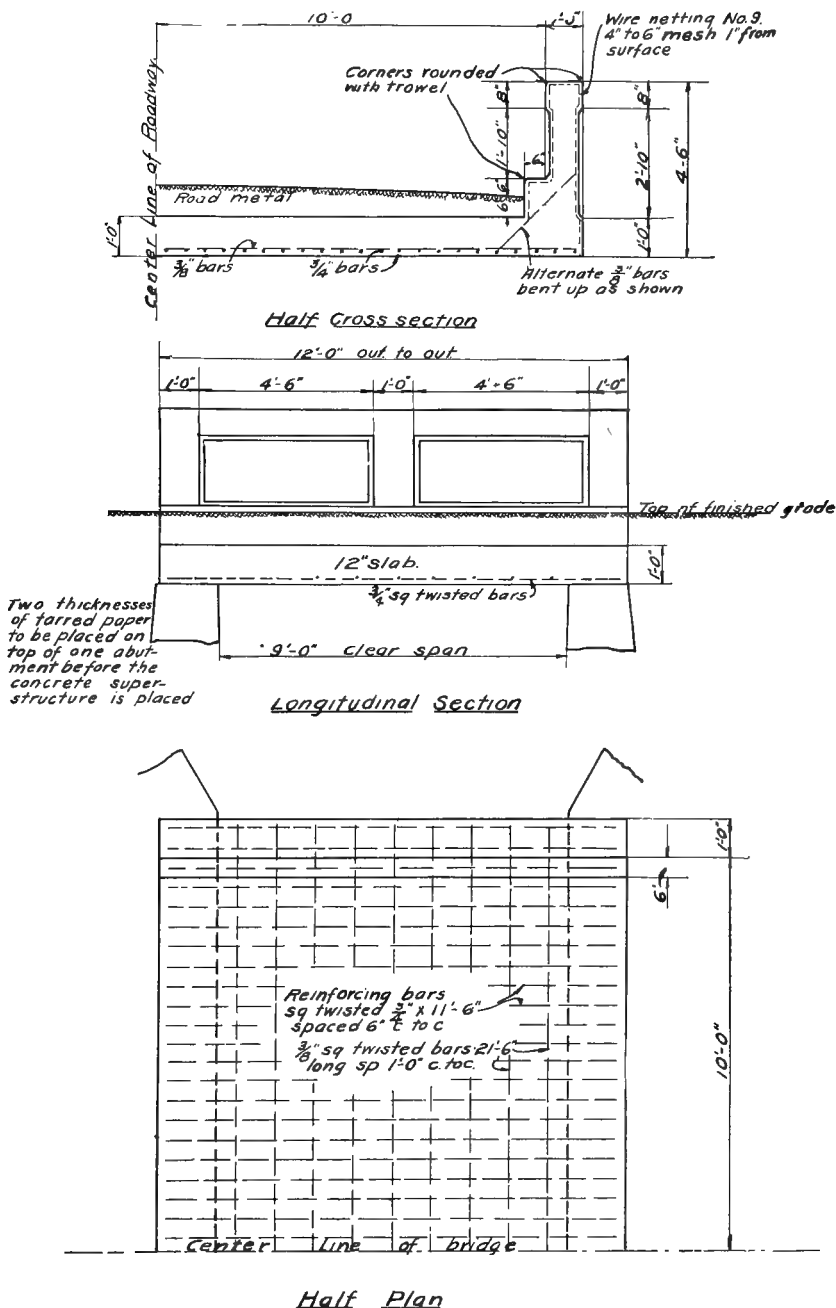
Standard concrete bridge of 9-foot span and 20-foot roadway. Designed by the Ohio State Highway Department. (Class "C" loading.)
